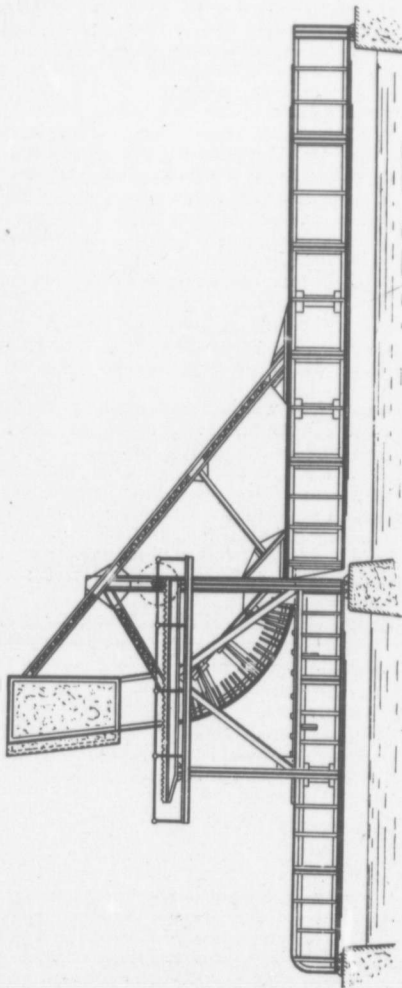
Side elevation of Rolling Lift Bridge over Rideau Canal.
